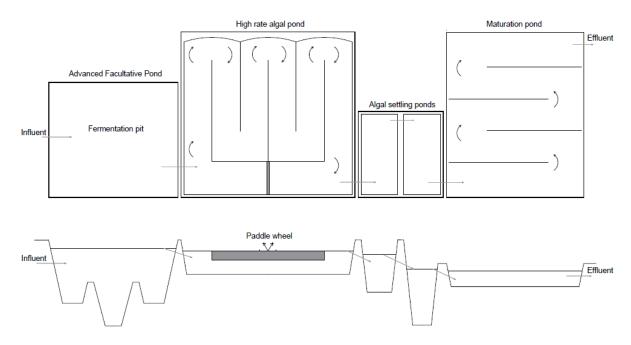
Plan view (top) and longitudinal cross-section (bottom) layout of Advanced Integrated Wastewater Ponding System (AIWPS) [Source: Shilton [72]]
